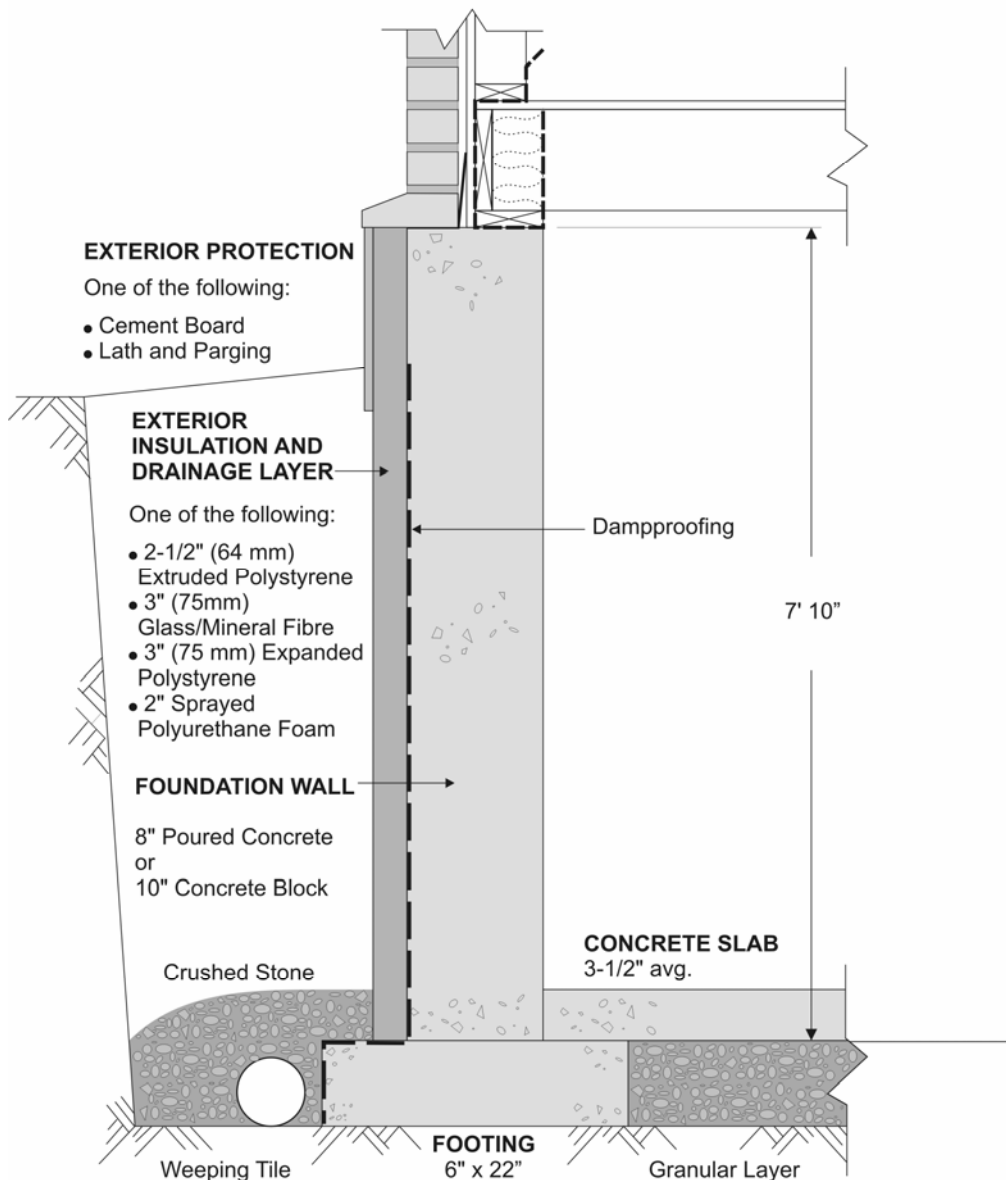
Basement system based on exterior placement of thermal insulation.
